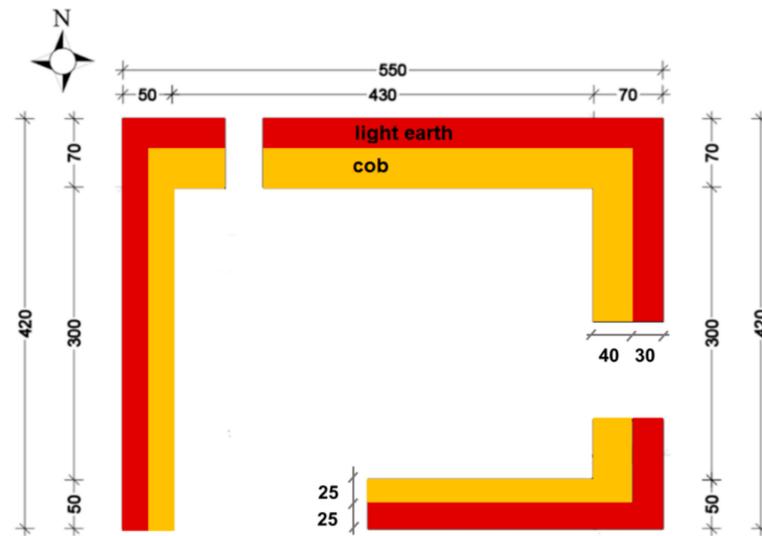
Scheme representing the two layers constituting each wall of the prototype building (dimensions are in cm).
